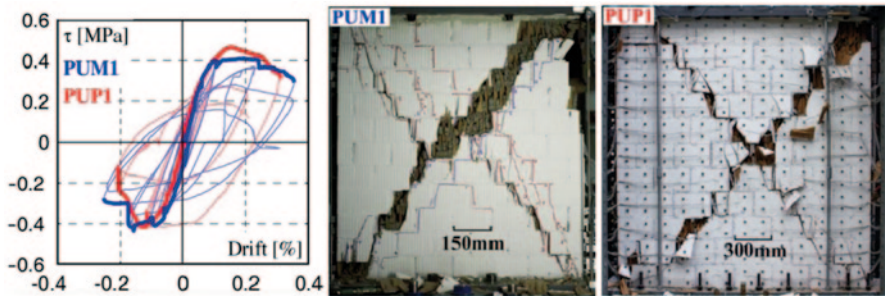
Results of quasi-static cyclic tests on URM piers: Shear stress vs. drift relationships for piers at scale 1:2 (*PUM1*) and piers at scale 1:1 (*PUP1*) as well as the crack patterns after axial load failure (Petry and Beyer 2014b)
